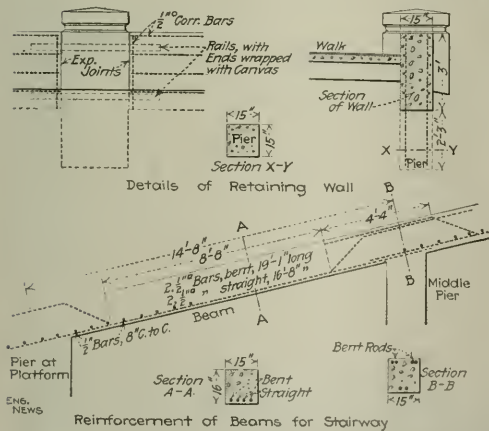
DETAILS OF LOW RETAINING WALL AND THE REINFORCEMENT OF THE BEAMS OF THE STAIRWAY
